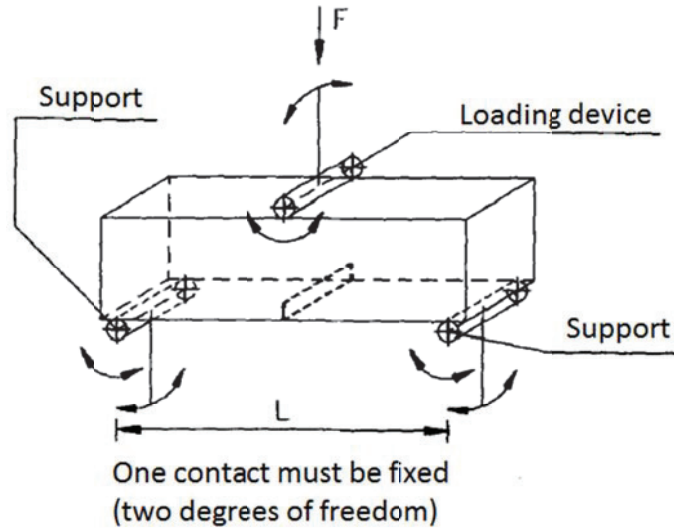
Position of the load and supports of the beam specimen (Vandewalle et al., 2000)
